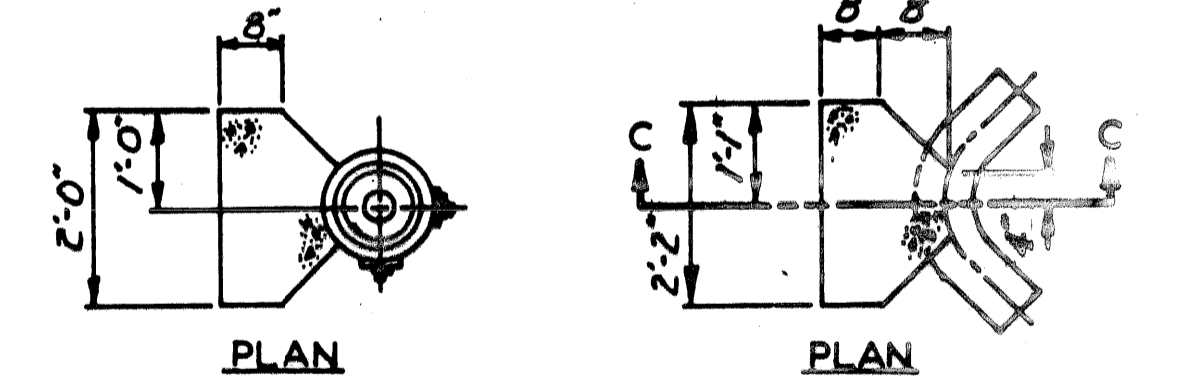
" HYDRANT INSTALLATION OFF SET
